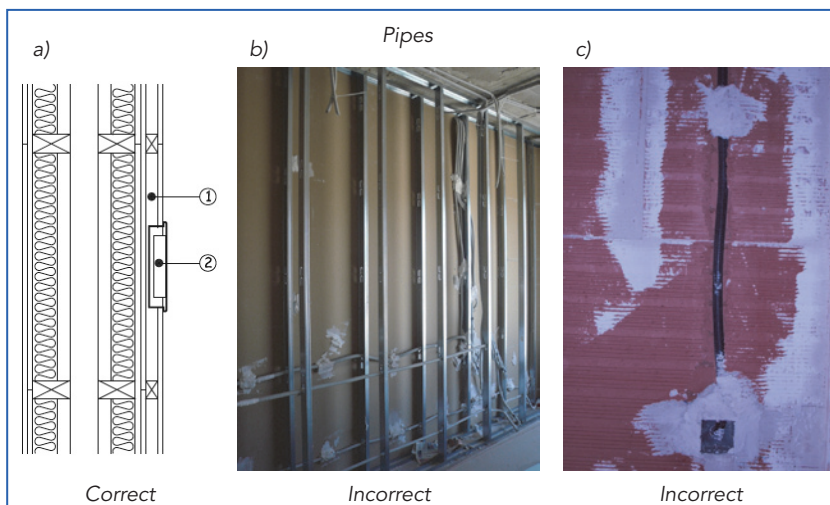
a) Plan view of a timber frame wall, where a service void (1) is provided on surface so that services (2) do not puncture the primary wall linings. b) Example of bad installation of pipes inside the cavity of a metal steel frame wall. As seen, pipes are attached with plaster to the plasterboards. c) Chases performed in clayblock walls must be filled with mortar or a similar heavy sealing material. The photo shows chases performed in a wall made of lightweight ceramic blocks, weighting 80 kg/m², which have not been filled completely with mortar.
